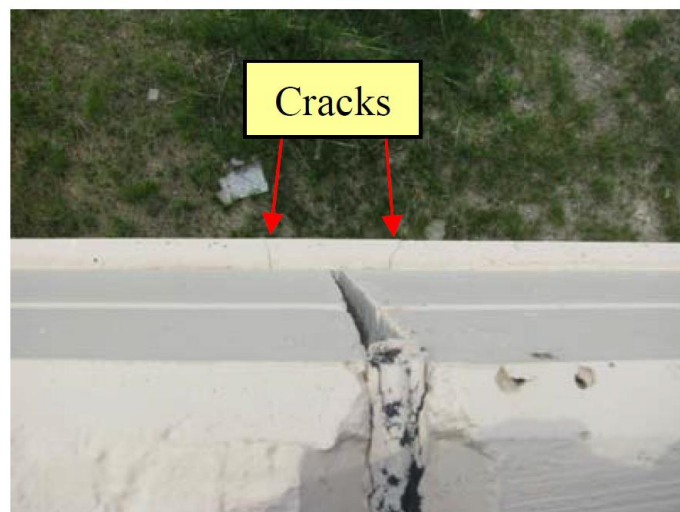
Crack observations from Camlachie Road Underpass link slab [8]
